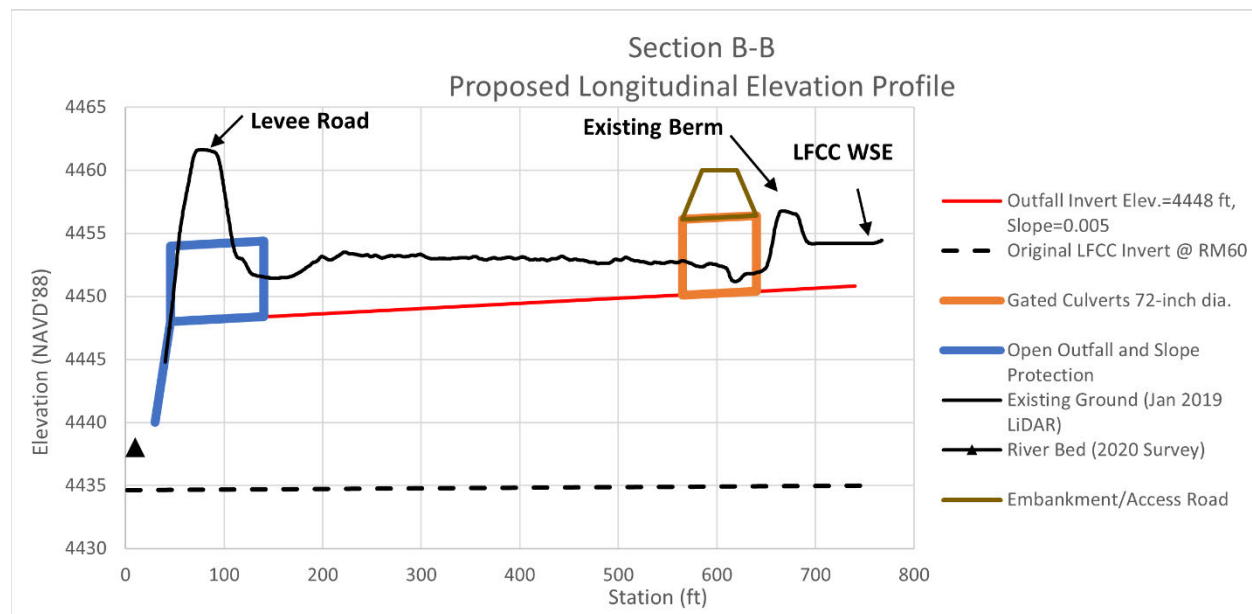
Proposed longitudinal elevation profile and Project components along Section B-B (Reclamation 2022a).
